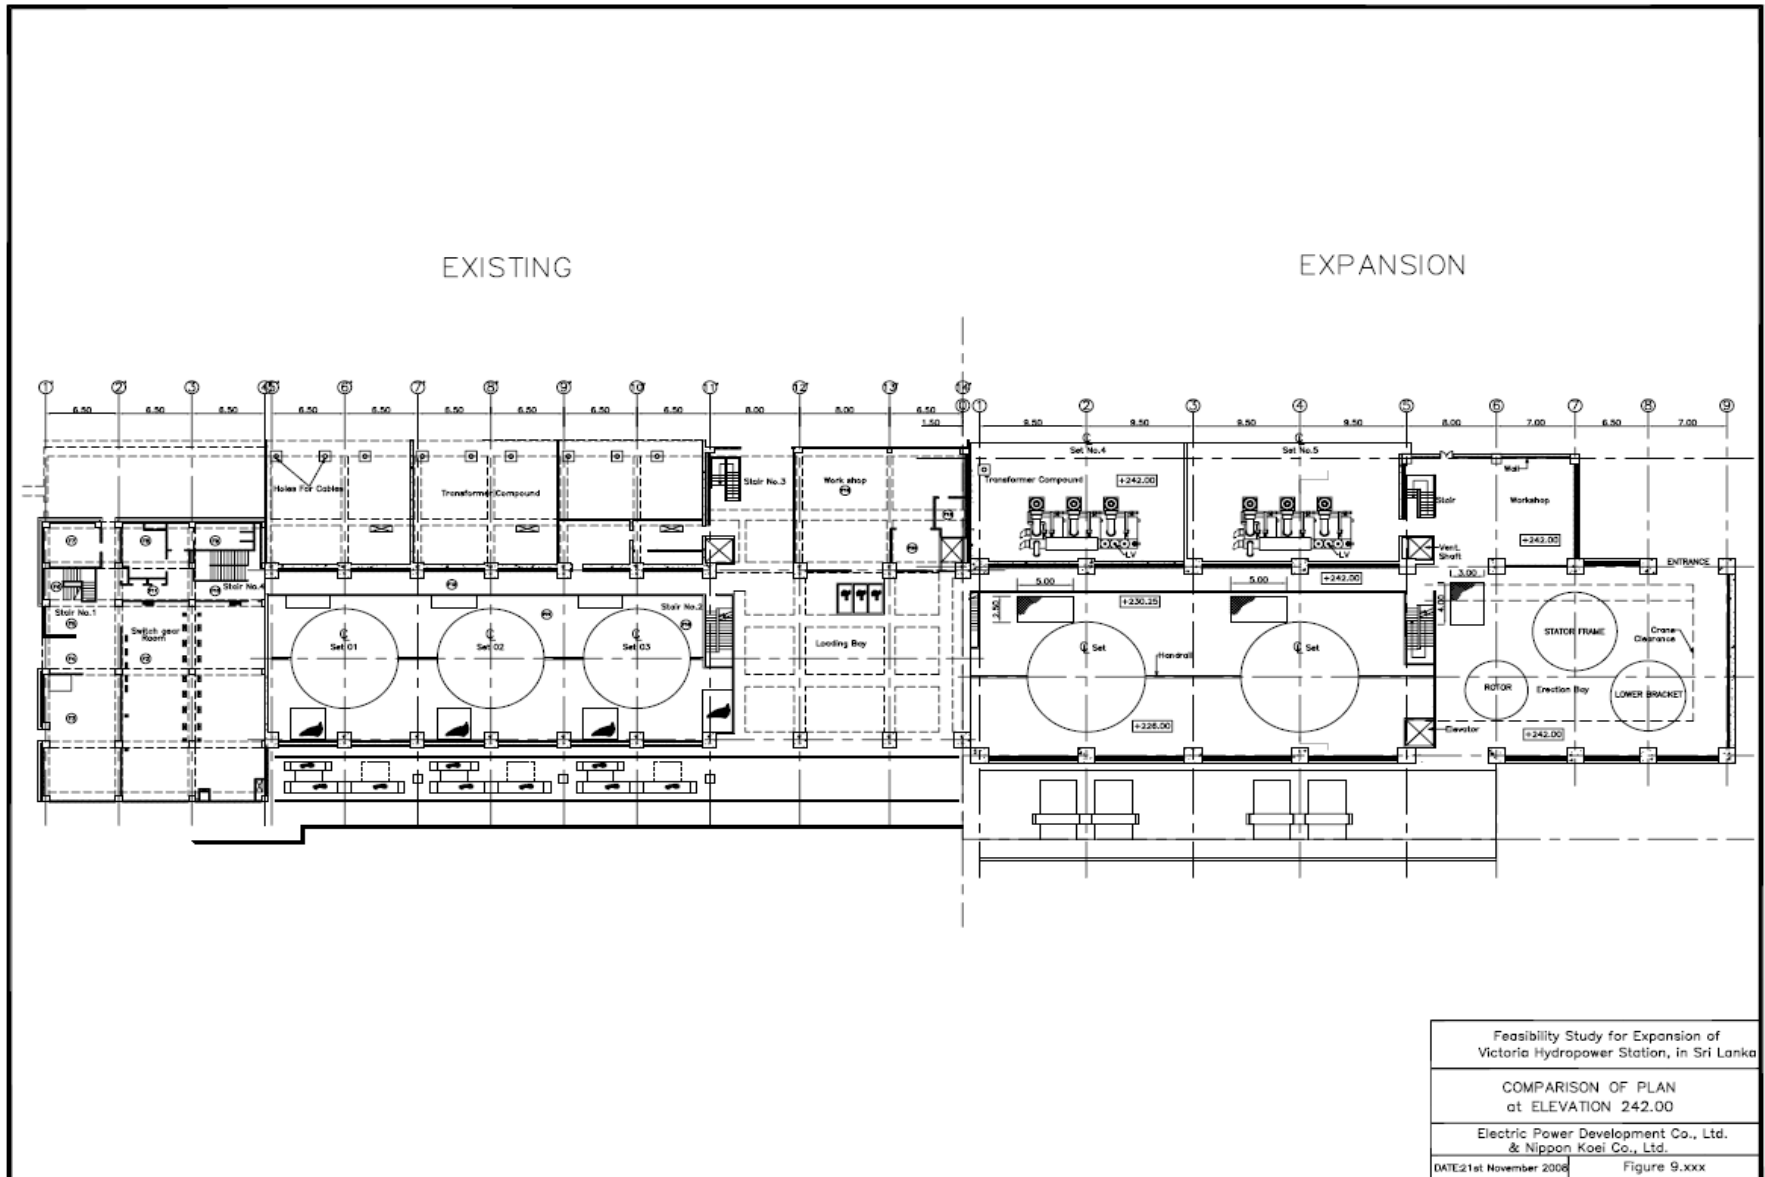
Plan of the Existing and Expansion Powerhouse
